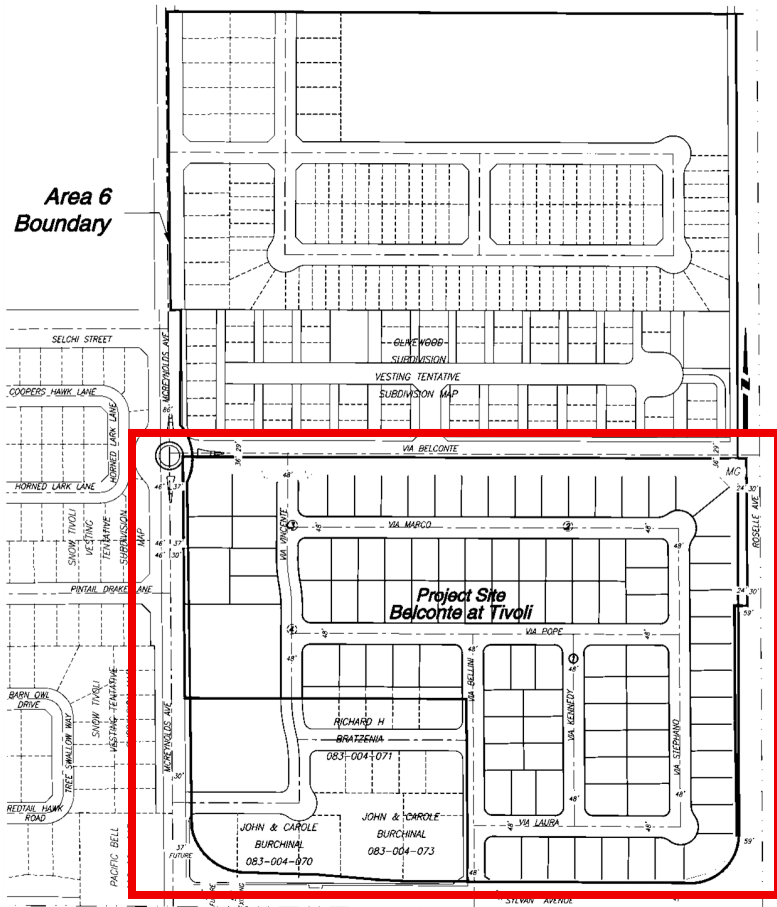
Area Plan 6 Showing Belconte Project Boundary
